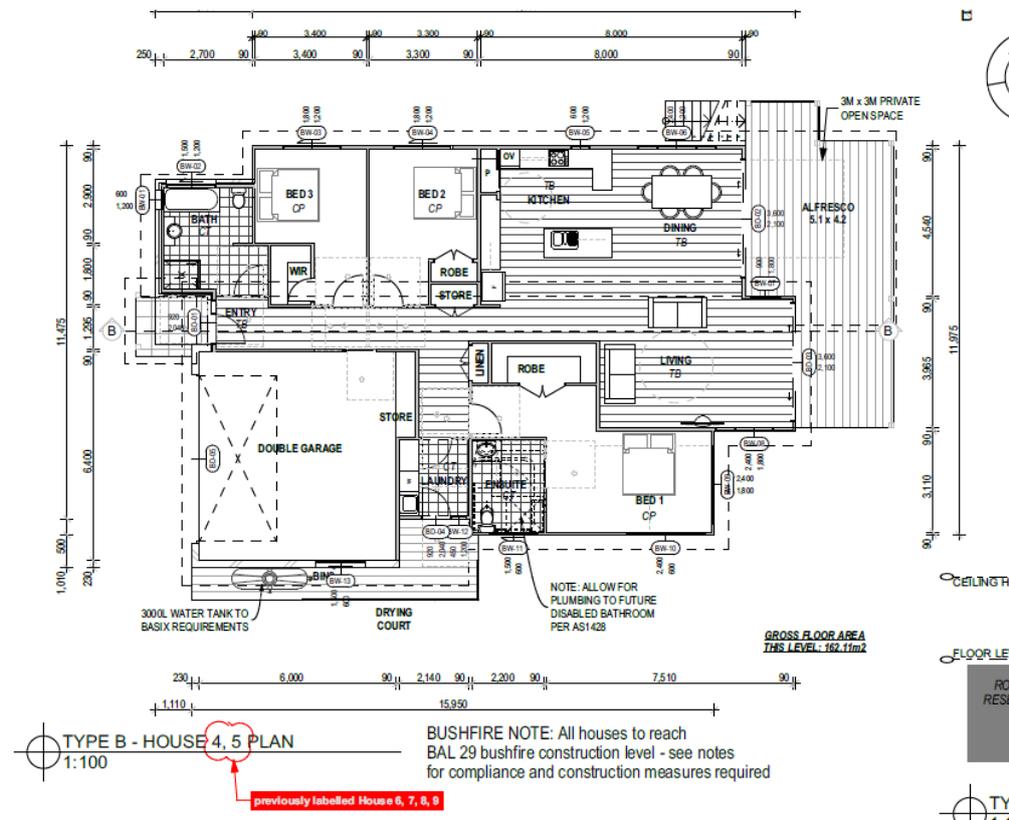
Proposed Housing Type B Floor Plan (Dwellings 7 & 8)
